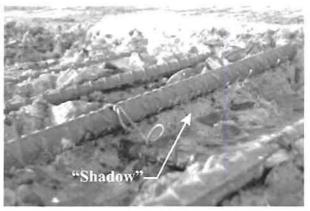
"Shadow" under the rebar (note tie wire undamaged and in excellent condition)
